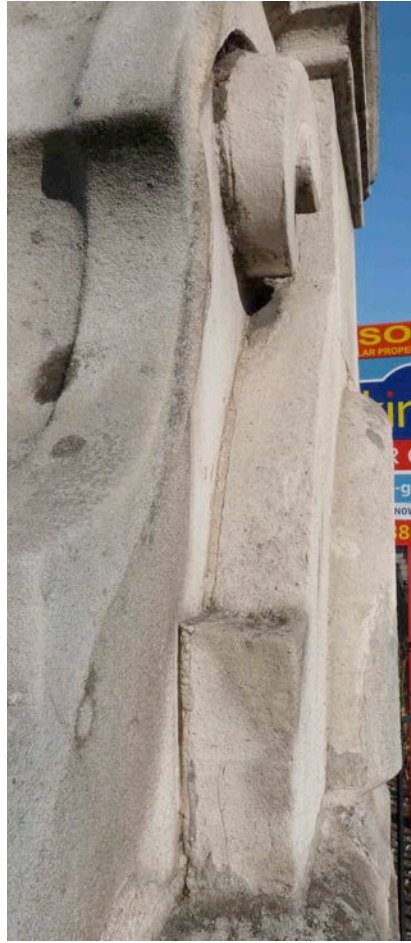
detail showing vertical joints between main stone and applied sections of arch on east elevation
